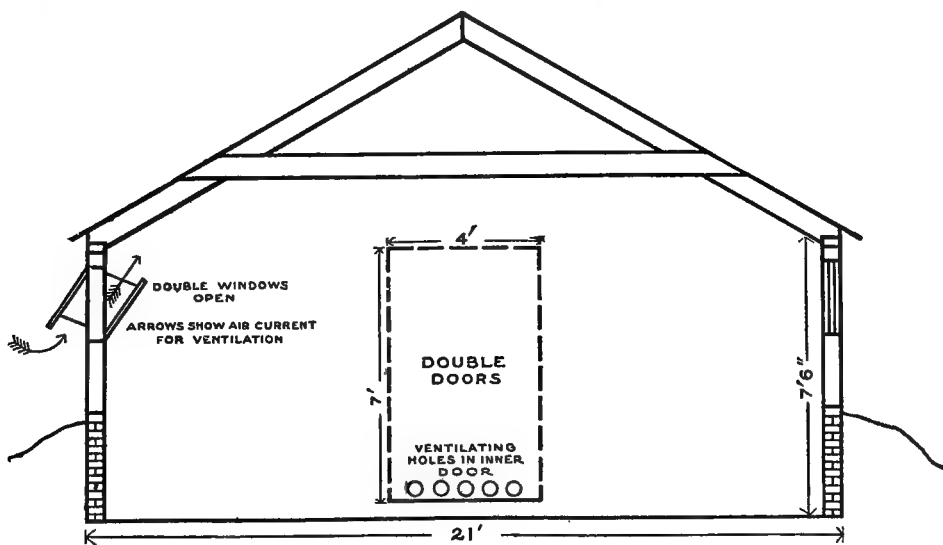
SECTIONAL VIEW SHOWING VENTILATING SYSTEM
